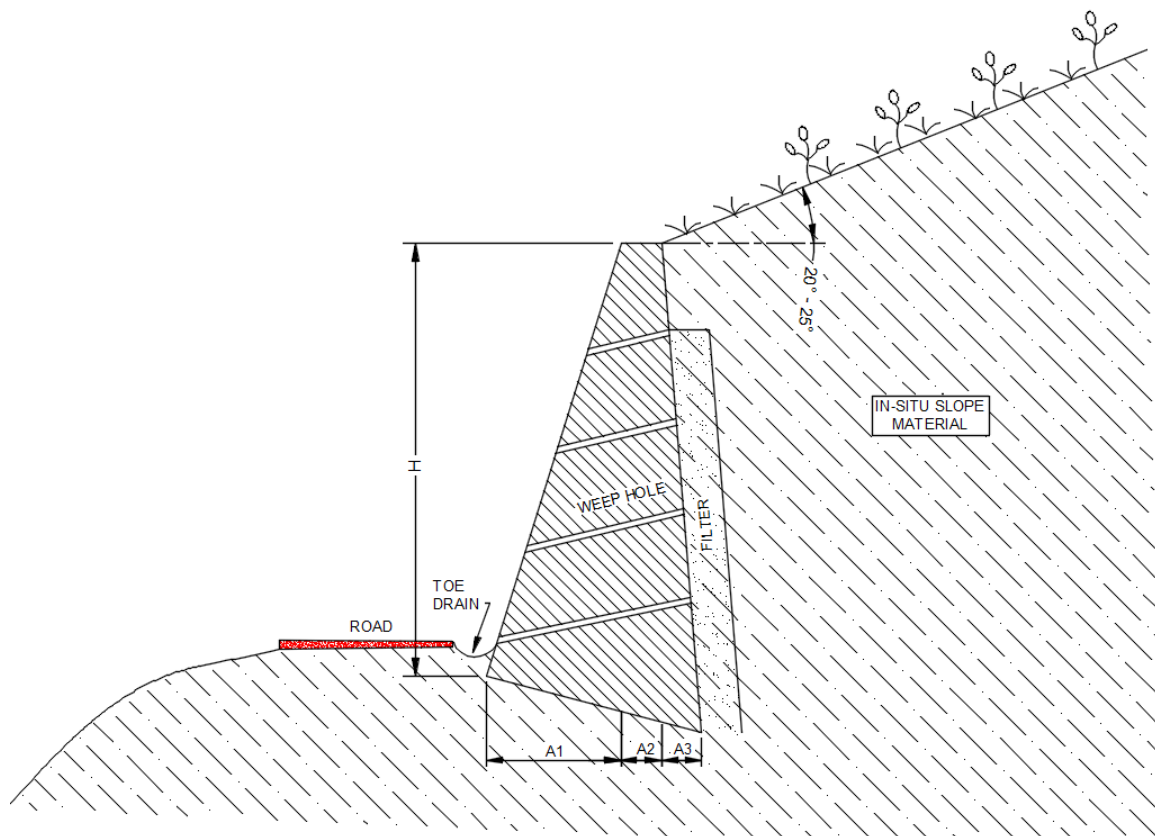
A TYPICAL SECTION OF A CEMENT STONE MASONRY WALL
